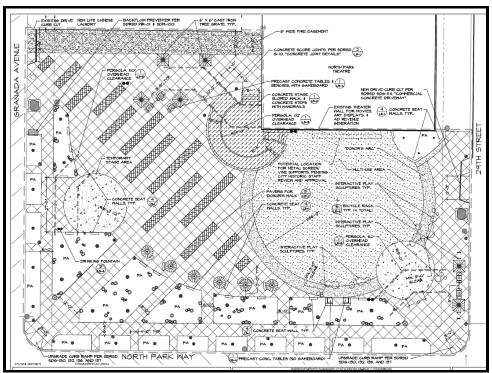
Conceptual Development Plan (Source: MIG 2017)
